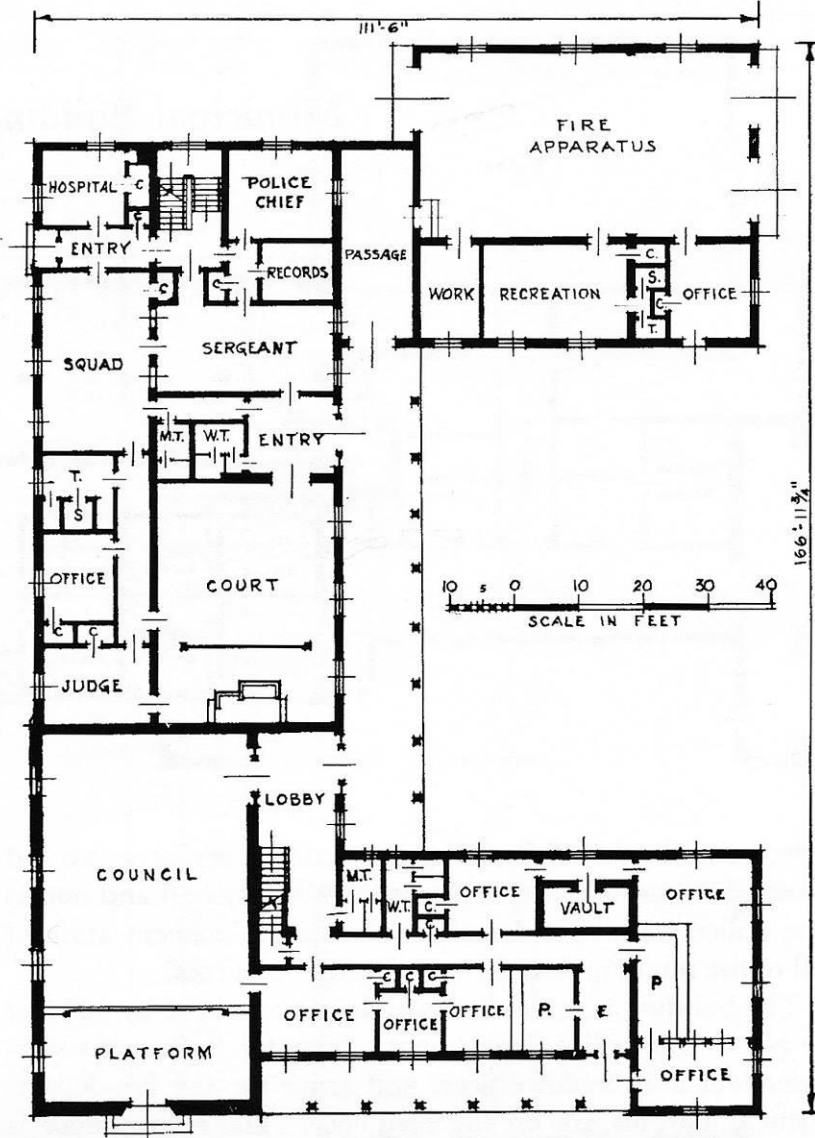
c. 1939 ground floor plan. Courtesy Da Capo Press.
